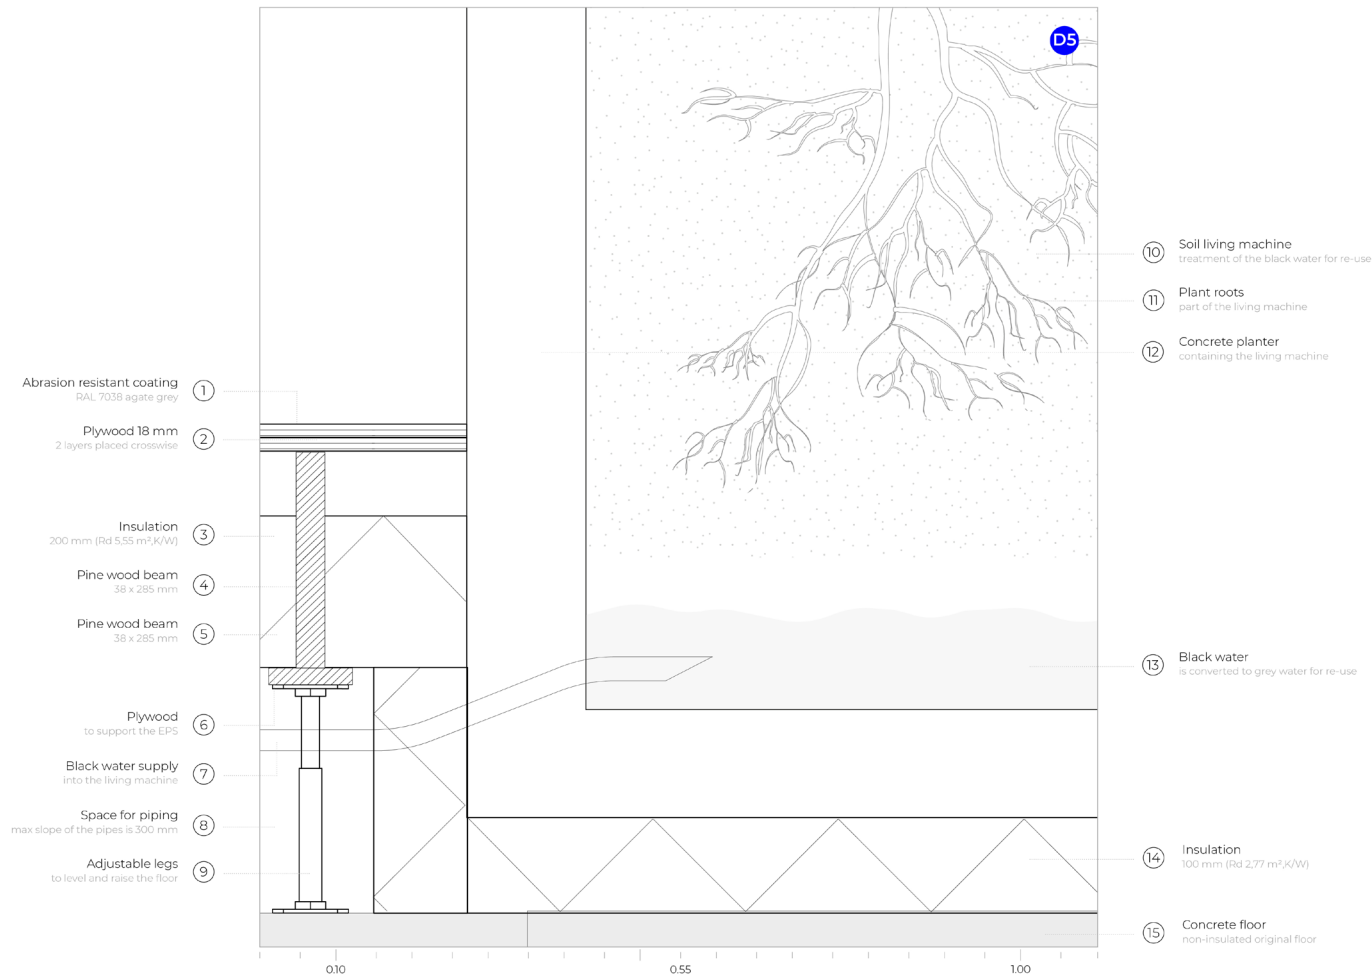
DETAIL DRAWINGS | VERTICAL SECTION D | SCALE 1:10
